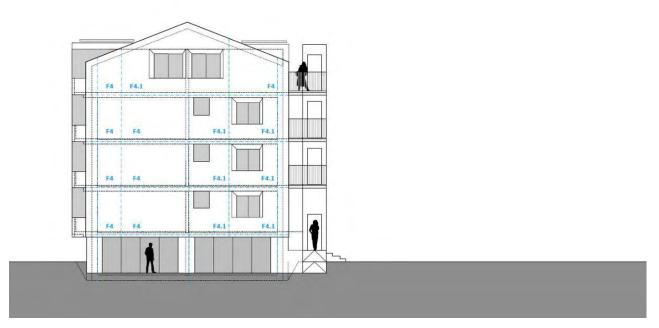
Southeast elevation (street-side façade with new office rooms in place of garages)
